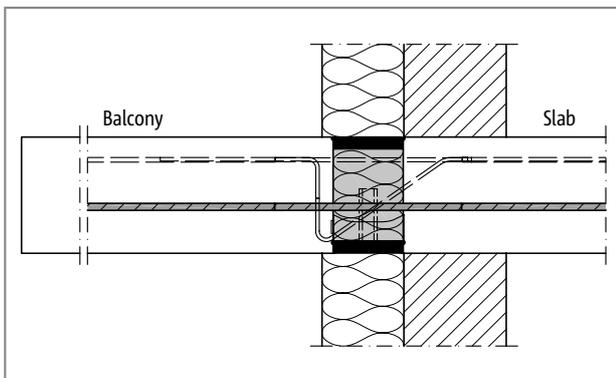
Schöck Isokorb® XT type K, H-NN: Masonry with external insulation
